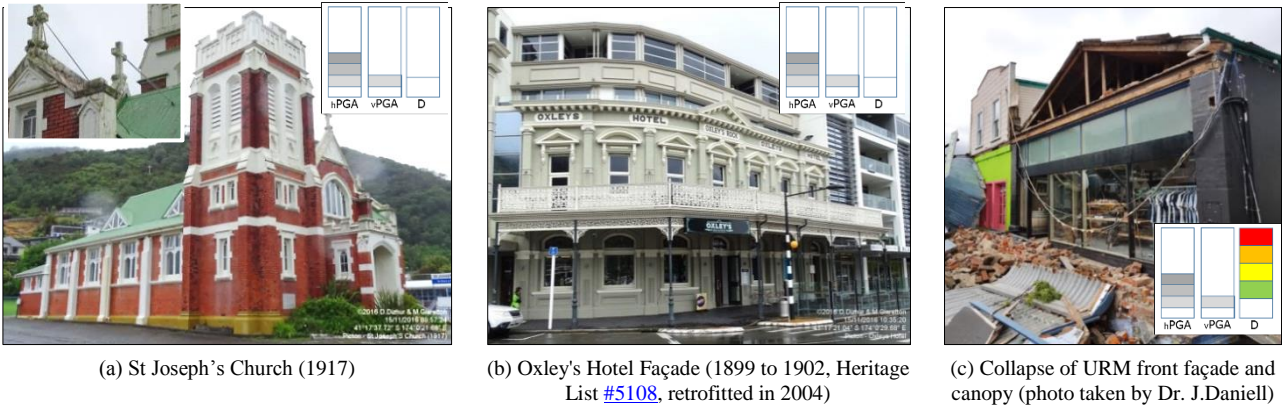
Unreinforced clay brick masonry buildings in Picton (hPGA 0.262g, vPGA 0.100g – QCCS).
